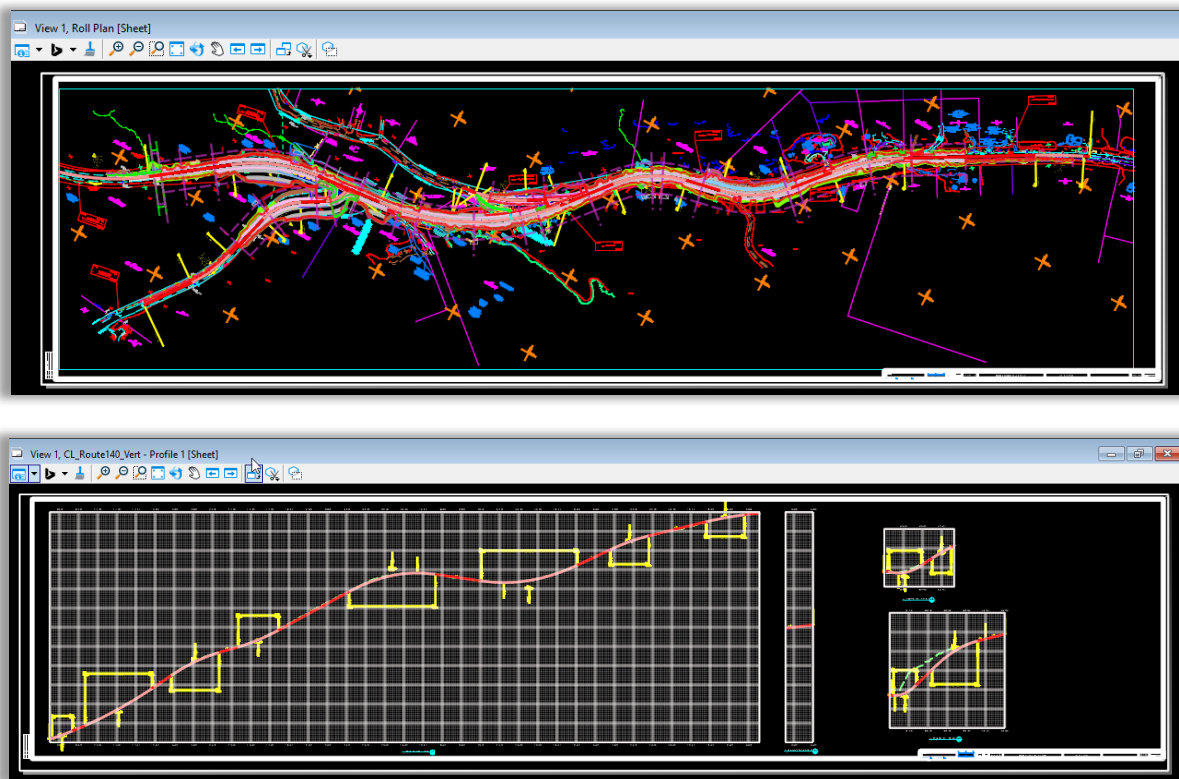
Above Roll Plan Sheet / Below Roll Profile Sheet
